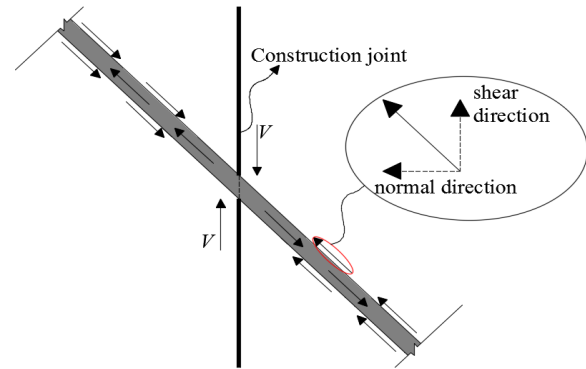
Stress distribution of transverse reinforcement along the construction joint
